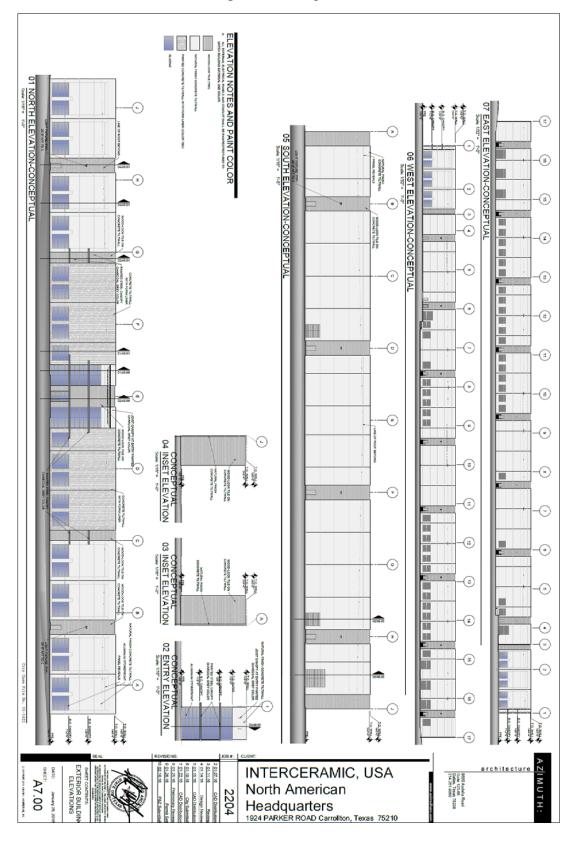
# EXHIBIT CSheet 4 of 10 Conceptual Building Elevations
